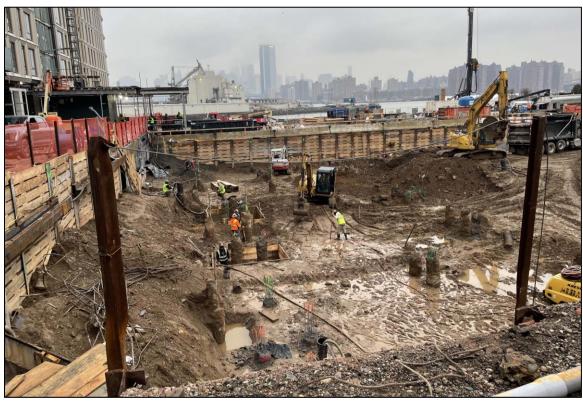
A3's southern half, facing west, standing on Kent Avenue ground surface.
